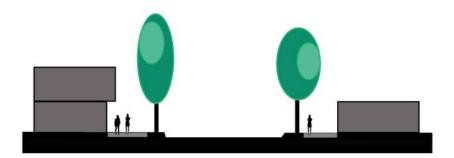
Schematic Atca building-pavement tree-street section (Autor 2024)
